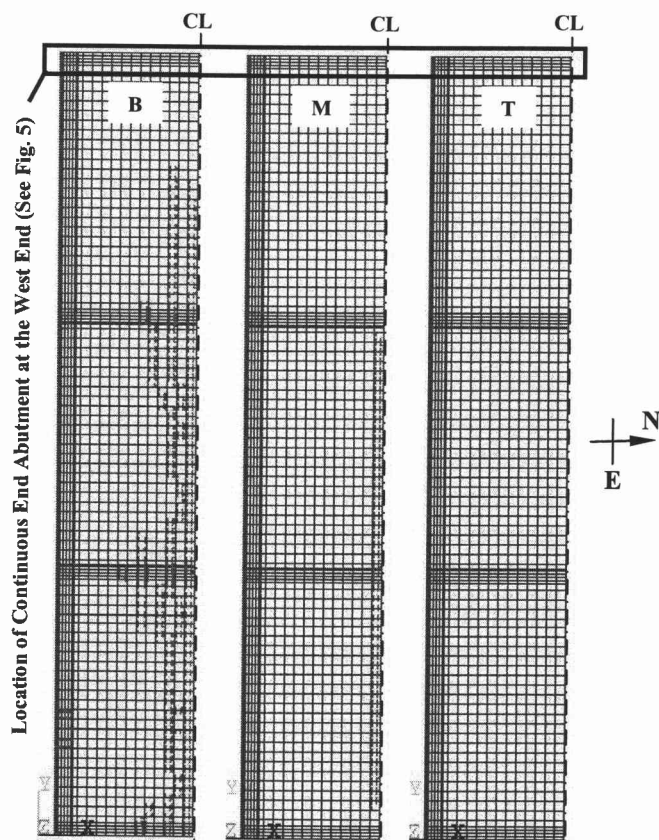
Initial Cracks in Bridge Deck
